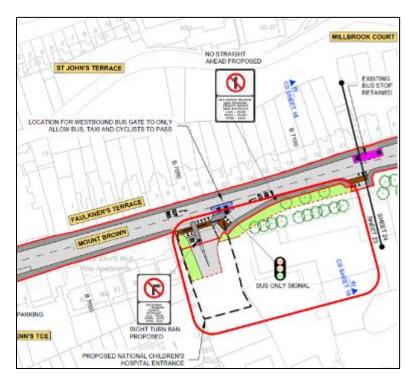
Proposed new Layout at the National Children's Hospital Access
